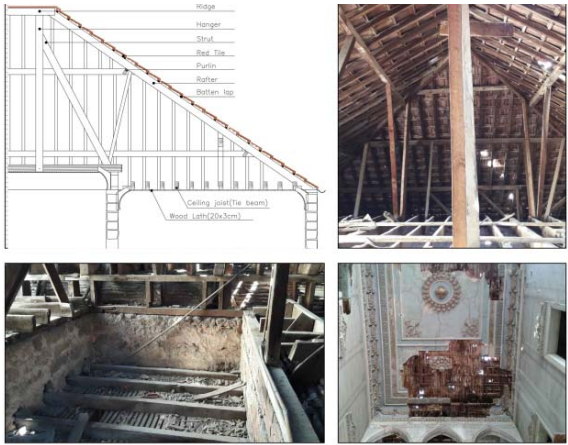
Showing the construction of Hipped Roof used in Kaaki building (idem).
